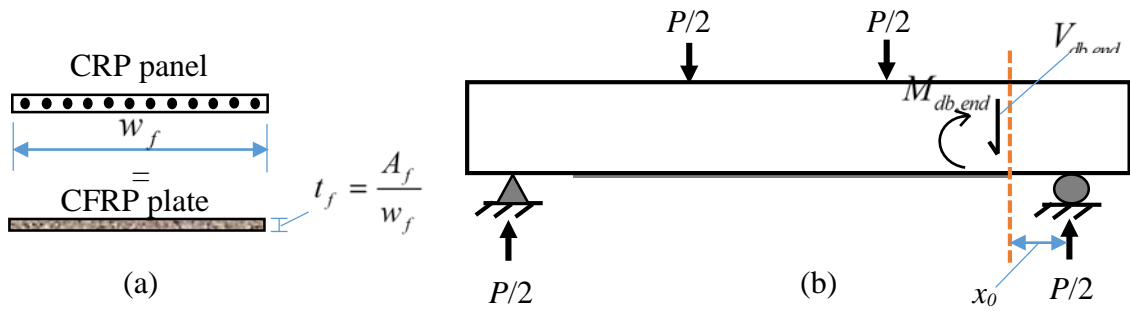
(a) Equivalent plate concept, (b) tested beam, showing shear force and bending moment at panel's end and applied loads.
